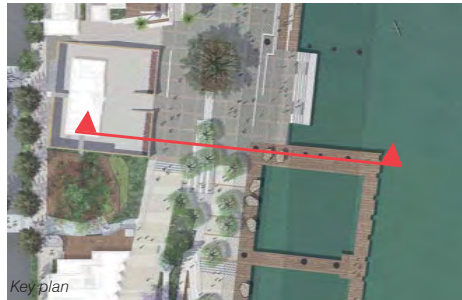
Undercurrent Village Typical Plan (Not to scale)
